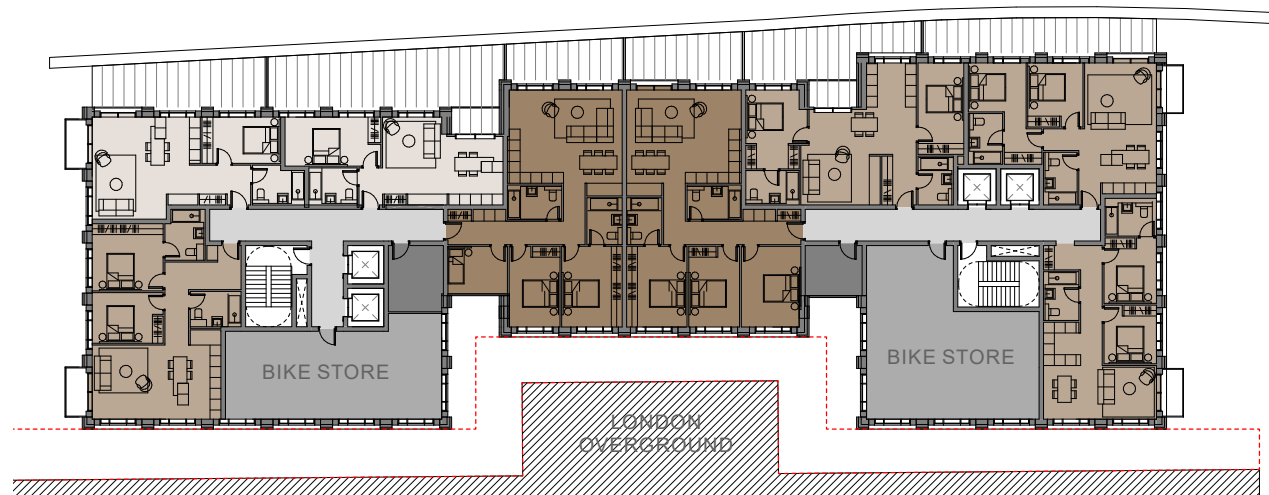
Illustrative lower Floor Layout Levels 1-3
